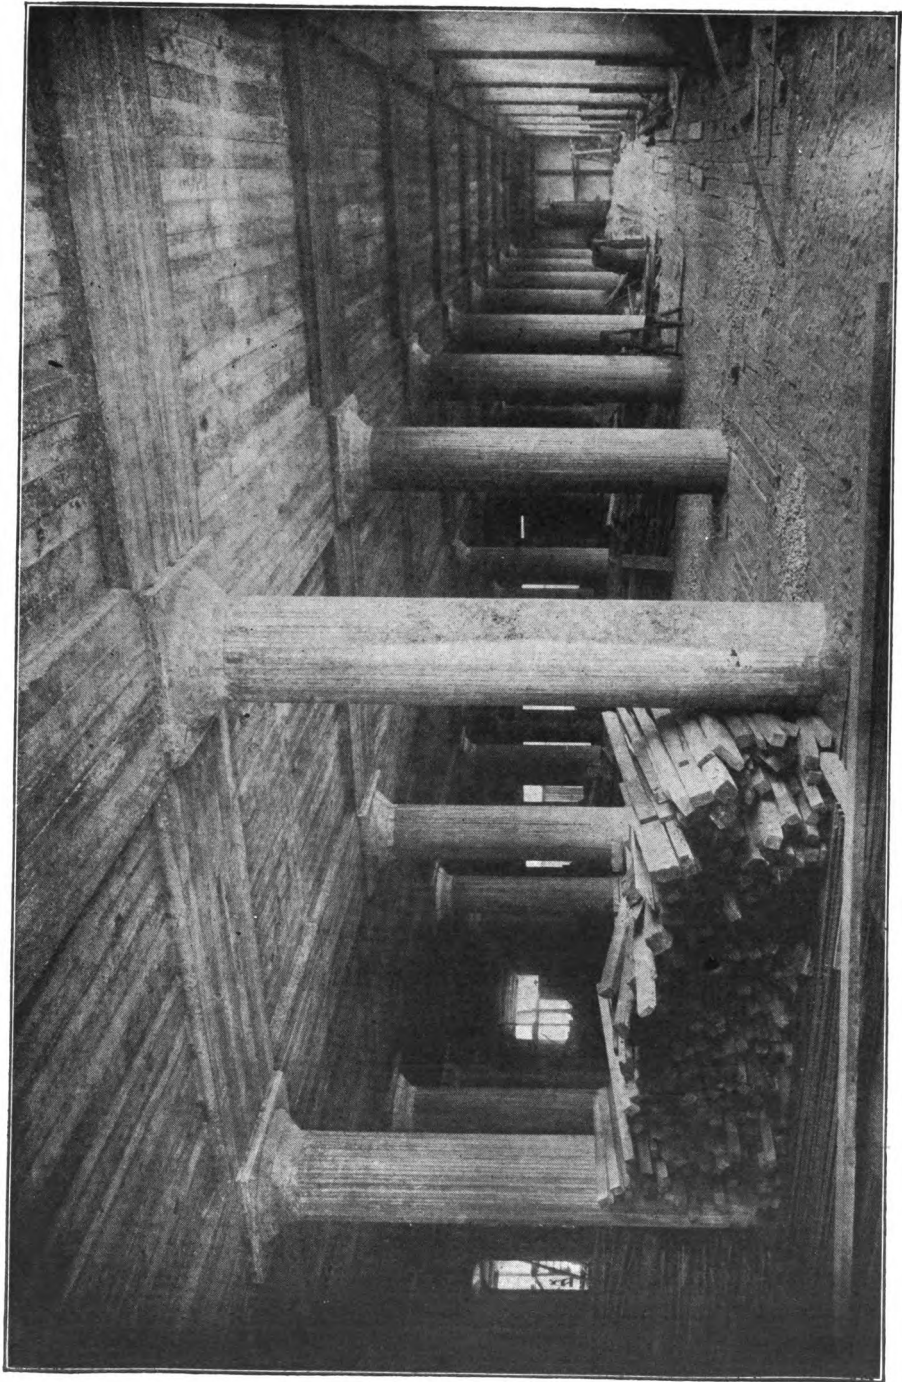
Reinforced Concrete Panelled Slab Construction, "C & S Type"
